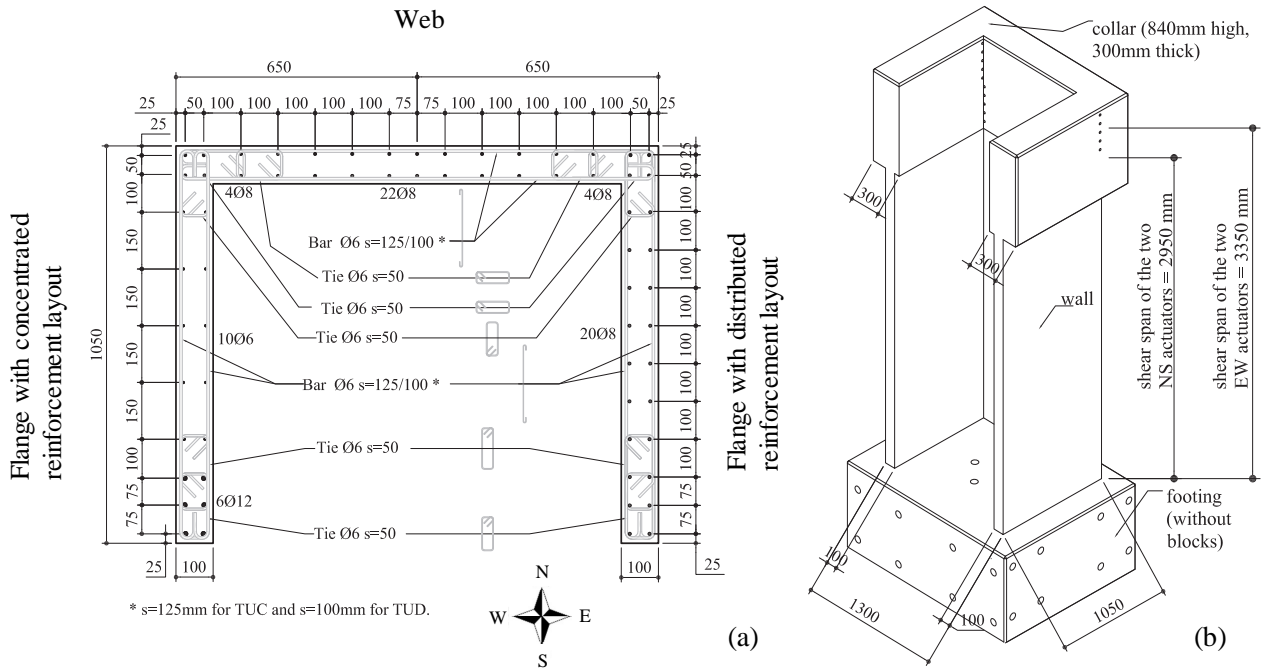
TUC experimental test unit: (a) cross section and reinforcement layout and (b) elevation sketch (measure in mm) [Constantin and Beyer, 2016].
